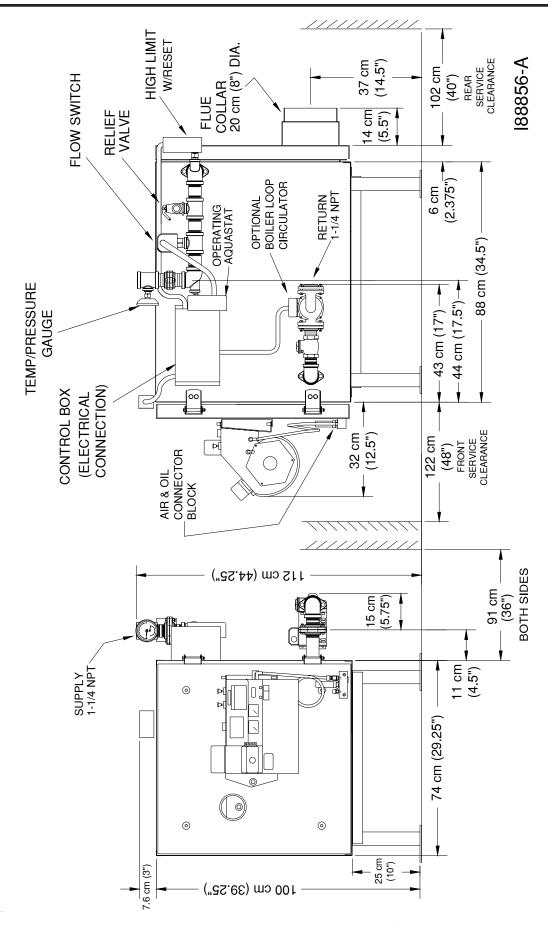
Model CB-200-CTB Dimensions (Single Boiler)
